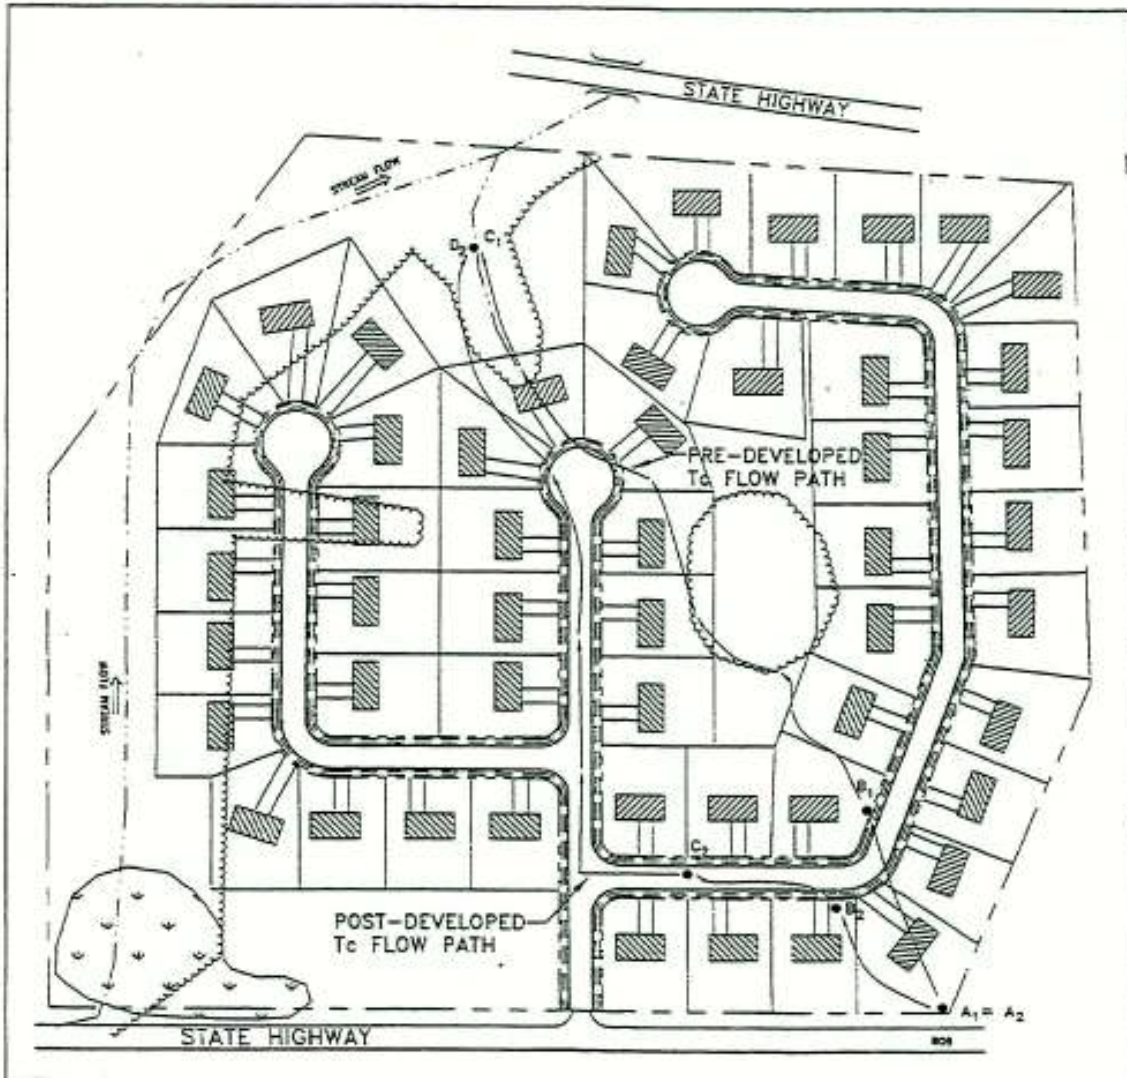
Site Layout for Wet Extended Detention Pond Design Example
